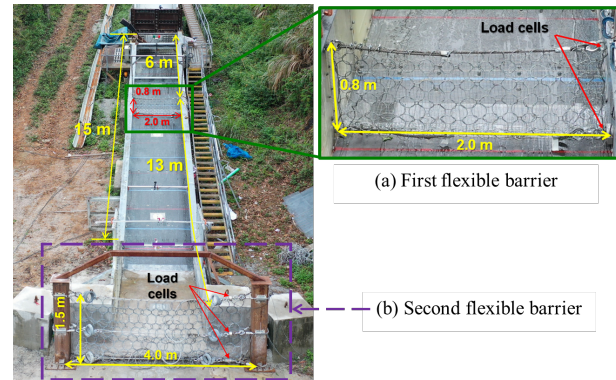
Dual flexible barriers model setup in the 28 m-long flume (a) first flexible barrier; and (b) second flexible barrier.
